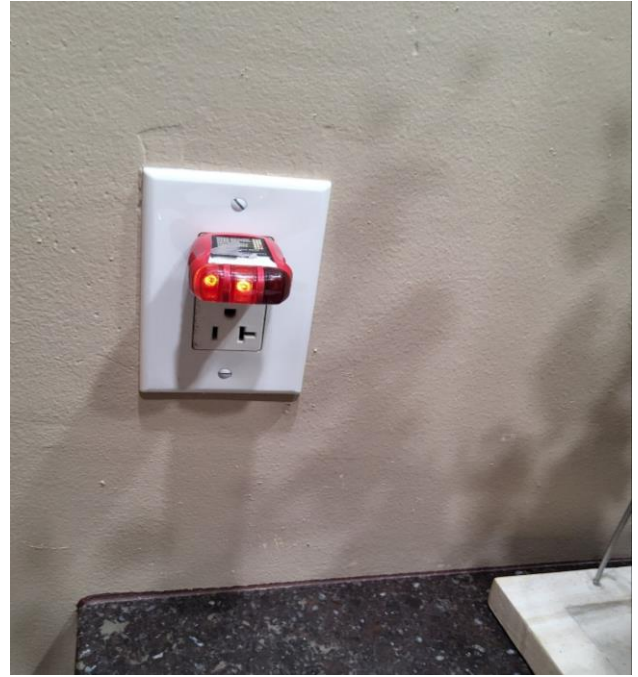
Item 28.2 Missing GFCI protection for receptacles in the bathroom- test fail.
